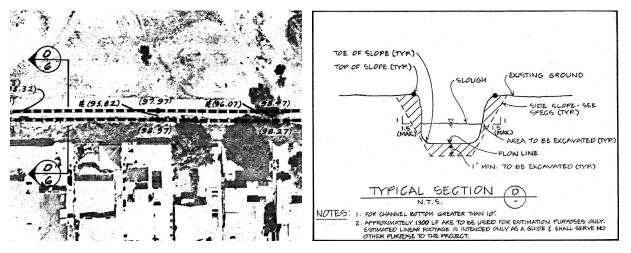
Typical West Slough Bankline and Flow Line Elevation Callouts (Left) and Dredging Detail (Right)
